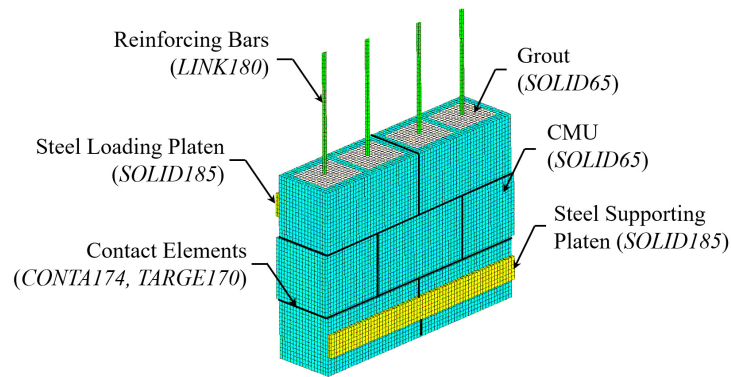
Element types in the reinforced dry-stacked wall.
